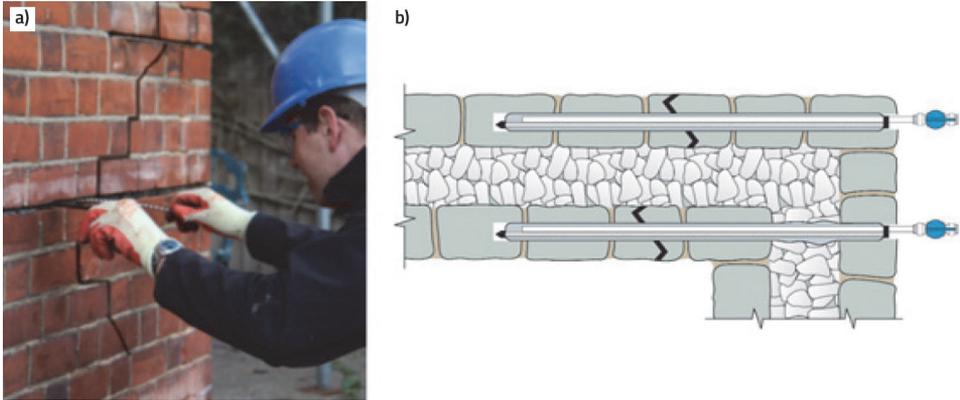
a) Helical bar installation. b) Threaded bars, sleeves and grout used to repair cracked masonry
